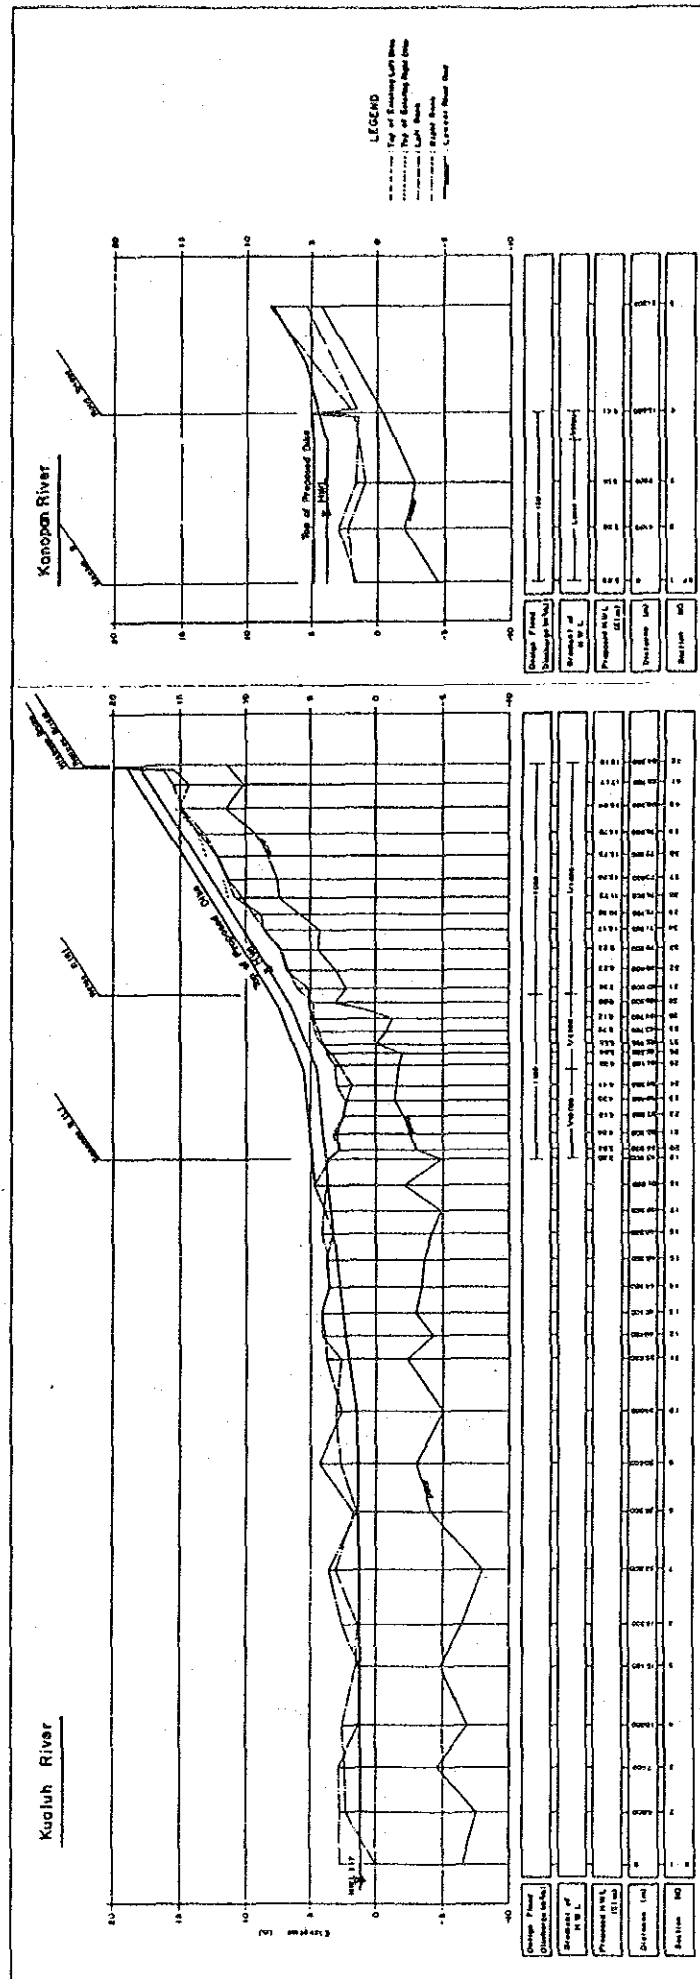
Proposed Long-Term Plan of Kualuh River (3/3)
